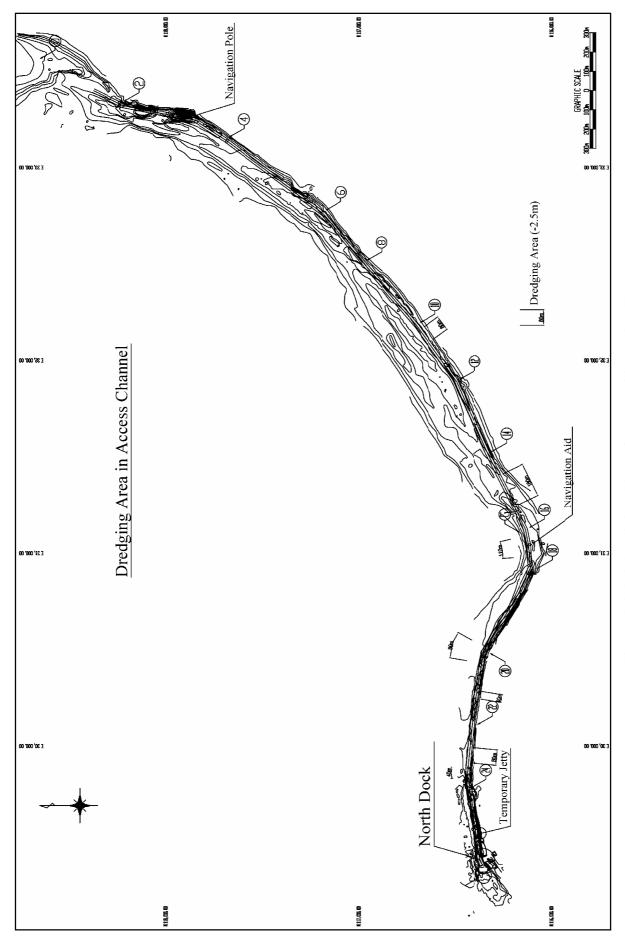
Dredging Plan of Access Channel (1/7)
